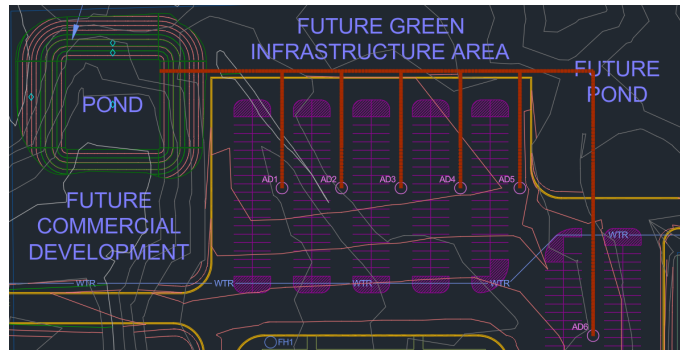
Layout the proposed storm pipe network with temporary construction lines.
